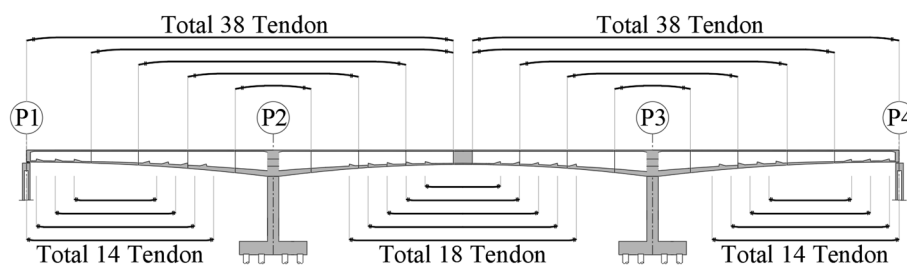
Longitudinal prestressing layout of Talkha Bridge
